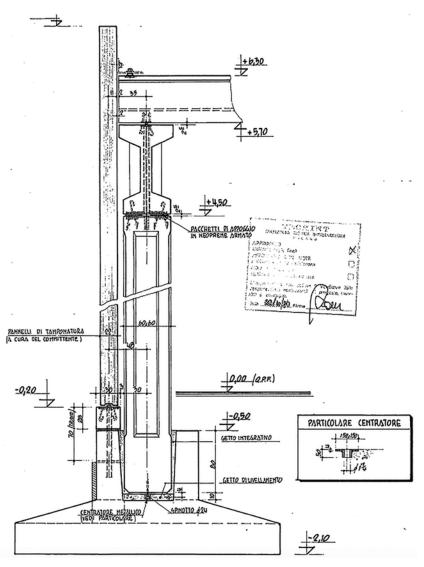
IBM Italia factory, a section of the structure: details. Source: courtesy Generale Prefabbricati S.p.A.
